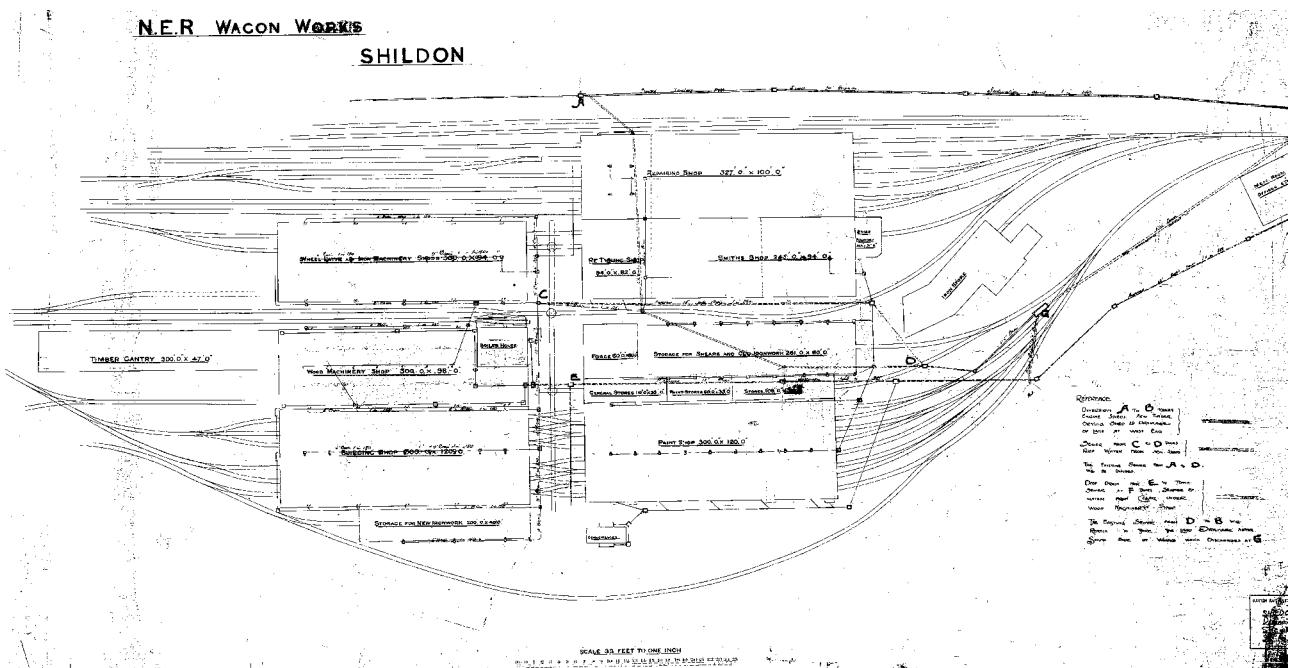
NER drainage plan, 1897, showing the layout of completed Wagon Works development. [Reproduced with permission of the Network Rail Corporate Archive, Shildon Works 111/19]
